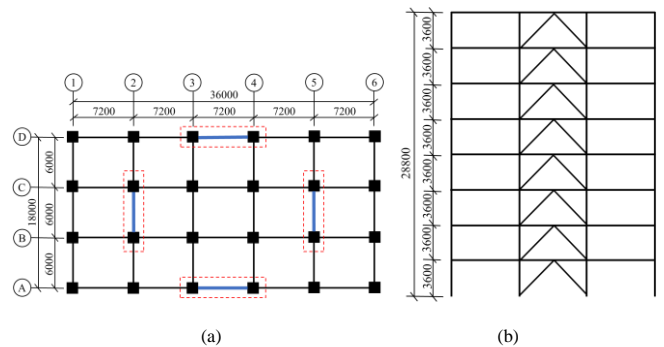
Steel frame layout. (a) Plan layout. (b) Elevation layout
